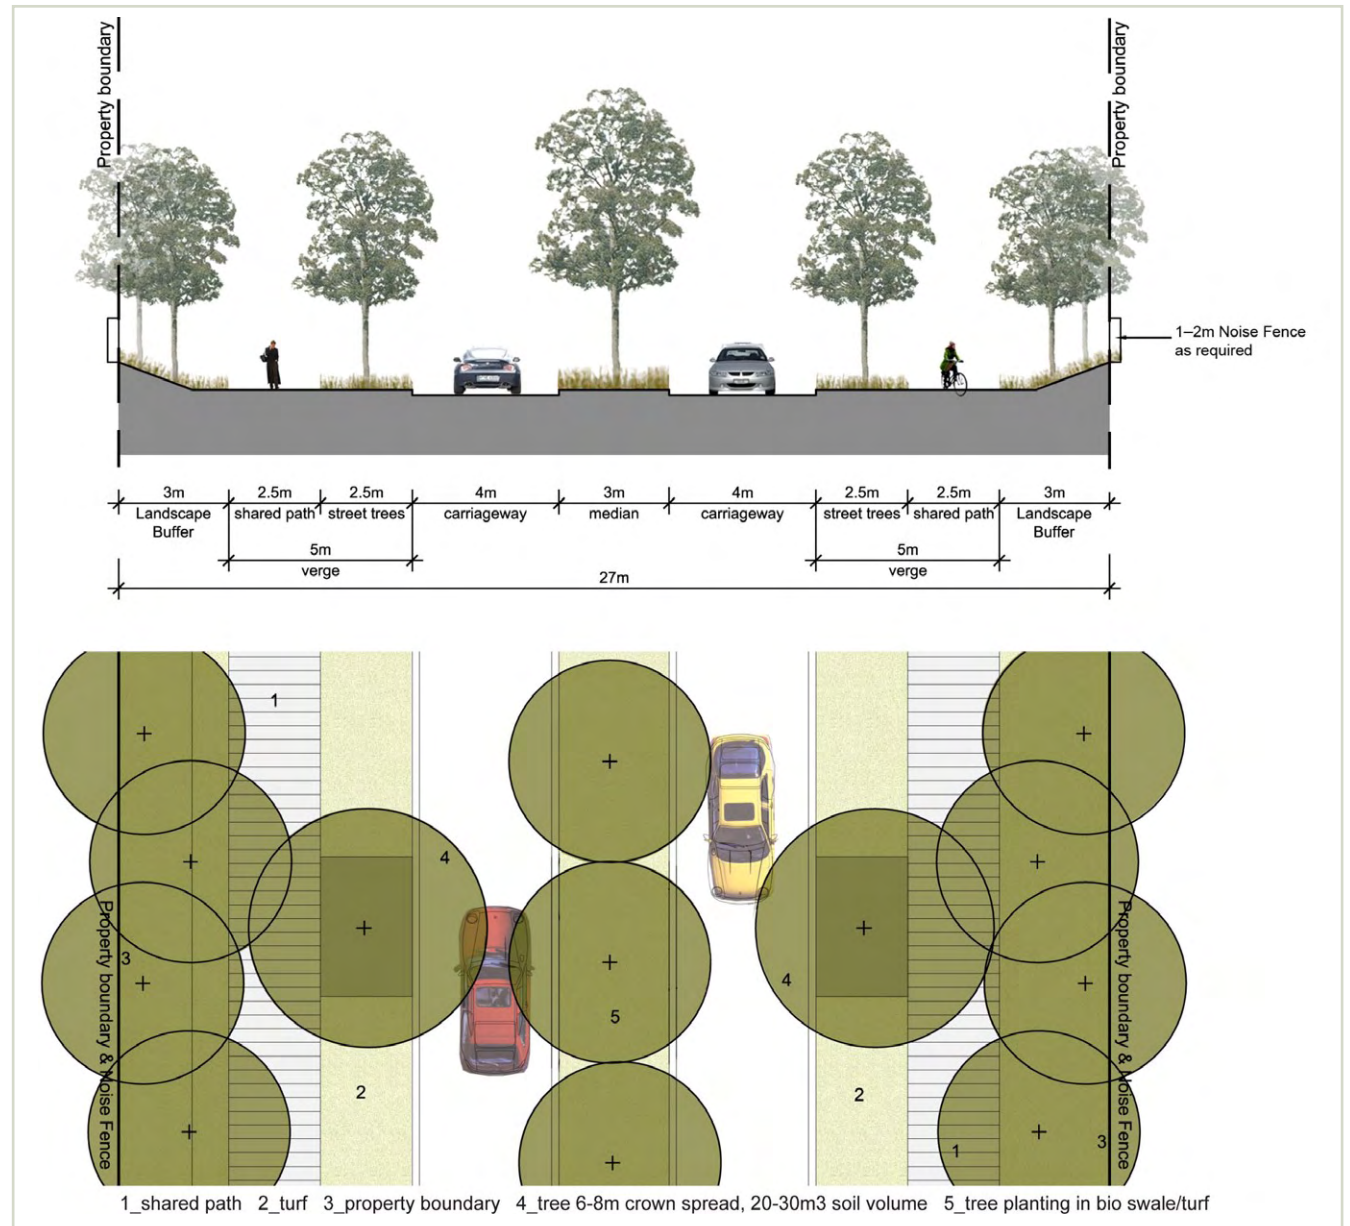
Minmi Boulevard - 27m (Section 1-1)
